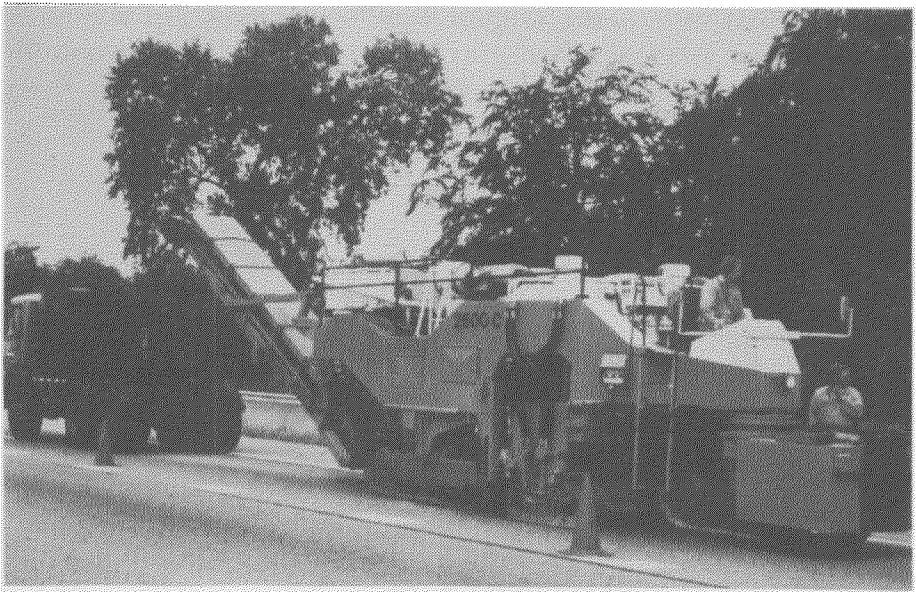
Cold planer for removing a layer from concrete and asphalt surfaces. (Credit: Wirtgen.)
